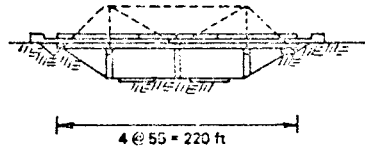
PRELIMINARY DESIGN DRAWING OF FRAME BRIDGE
